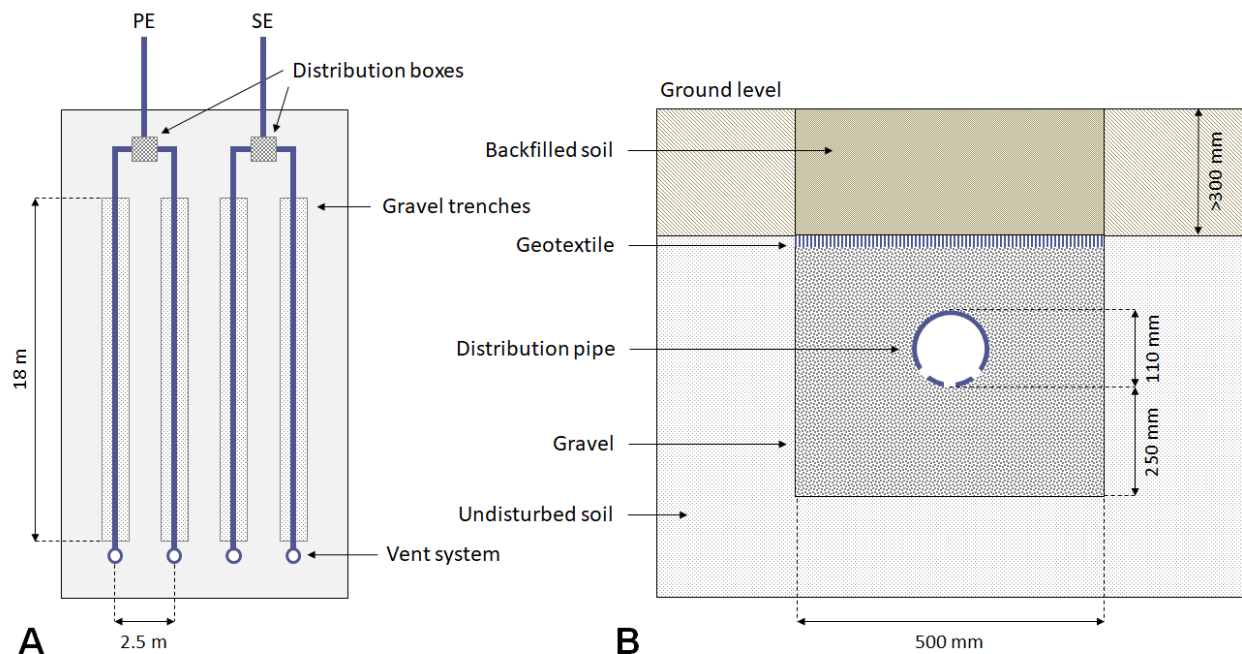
(A) Plan view of the STU. (B) Section of a STU gravel trench.
